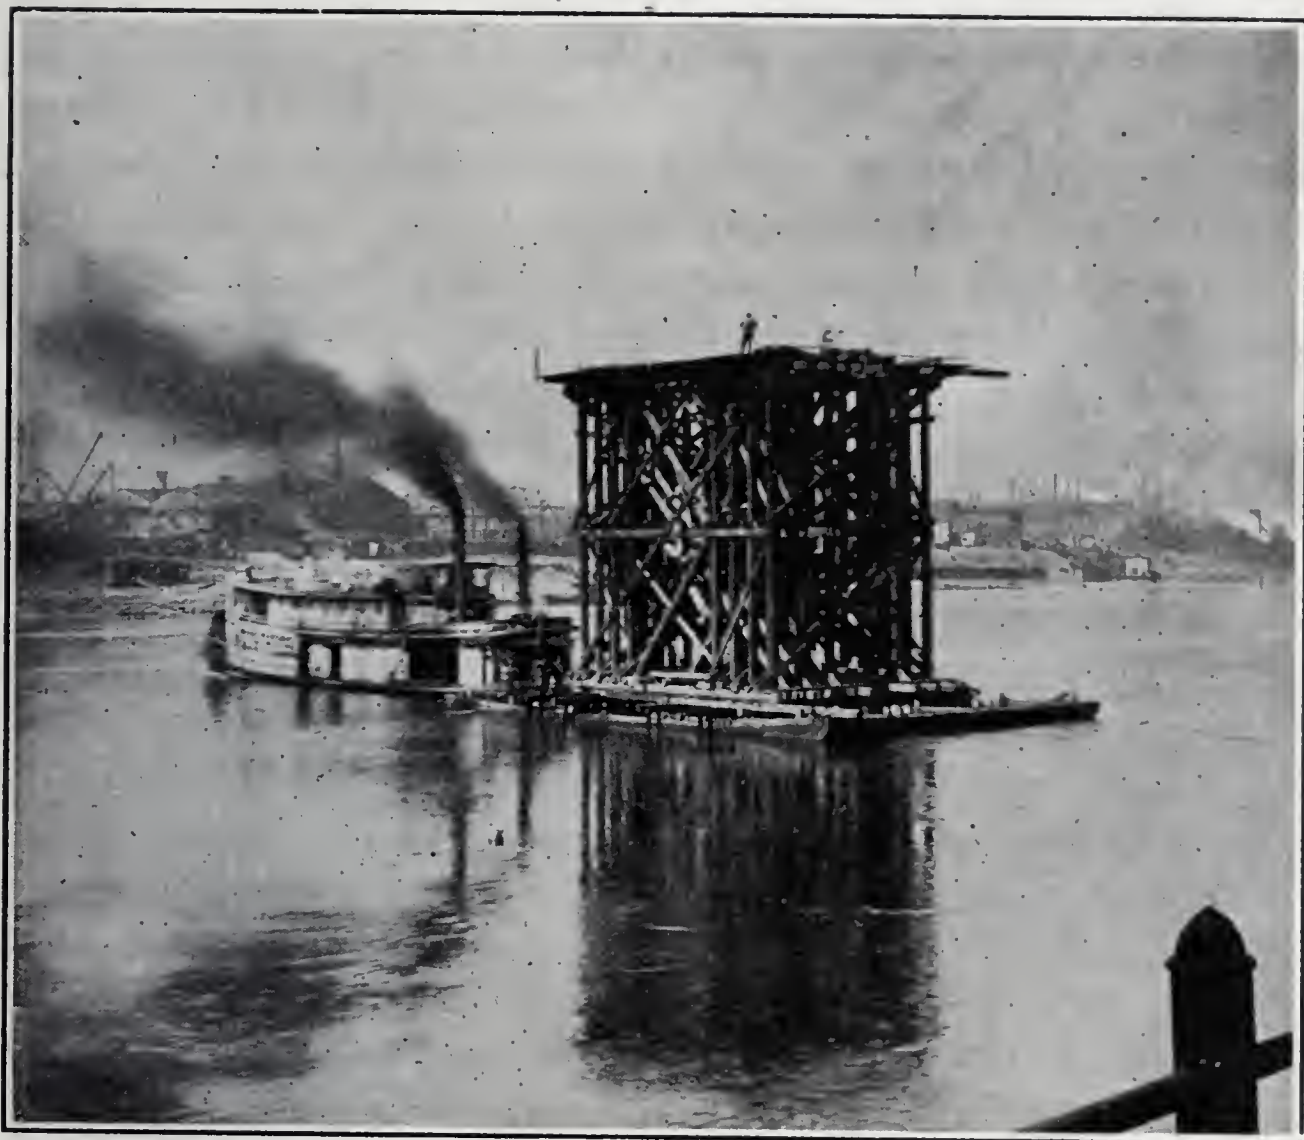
South 22nd St. Bridge. Moving False Work from North Pier to South Pier.
